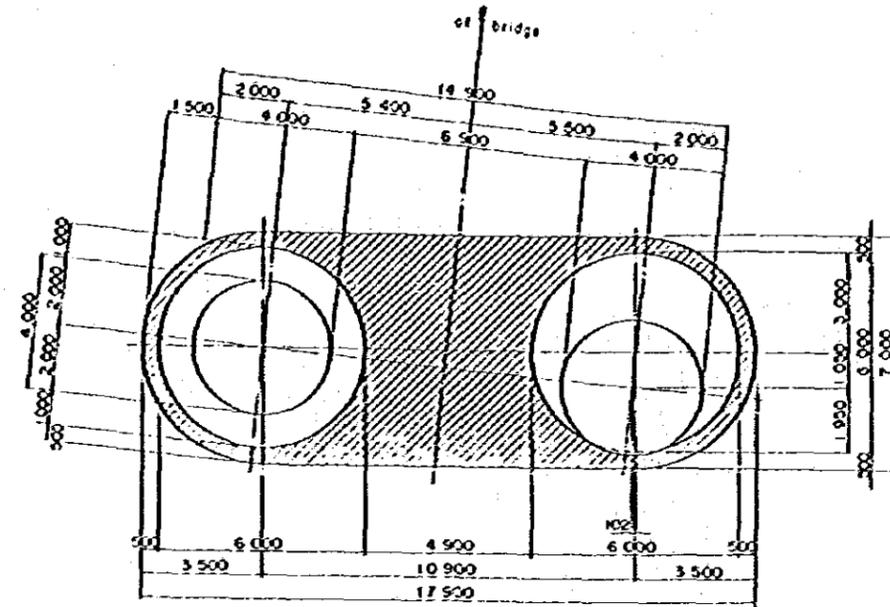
C-Pier Rehabilitation Plan No. 1
